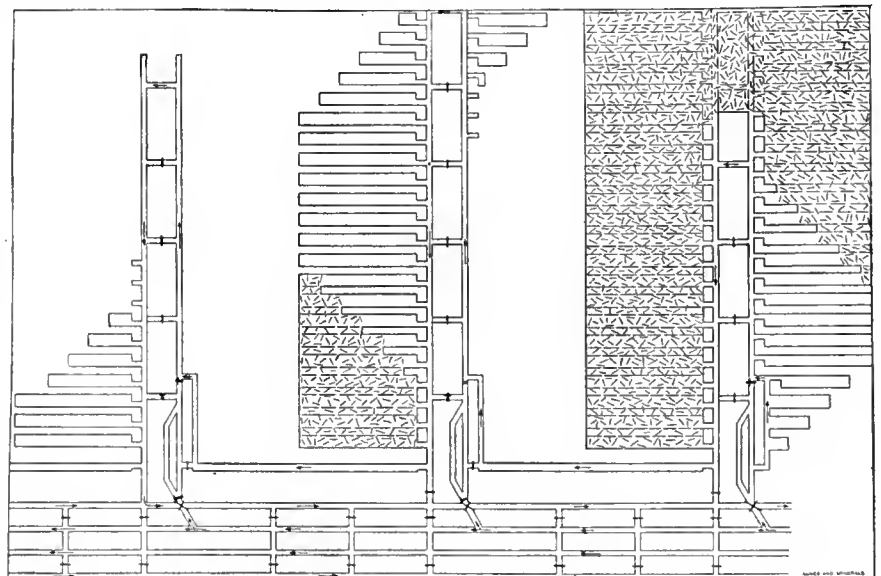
PILLAR DRAWING WITH WIDE ROOM AND NARROW PILLAR
